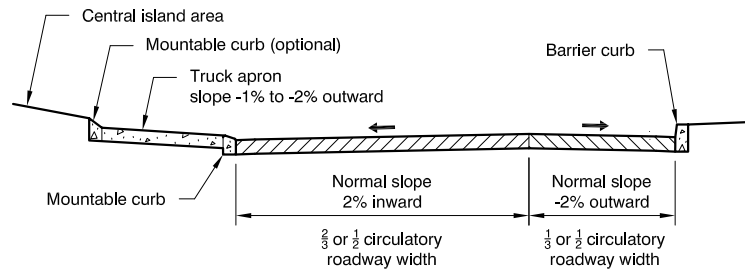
Typical Circulatory Roadway Section with Truck Apron
